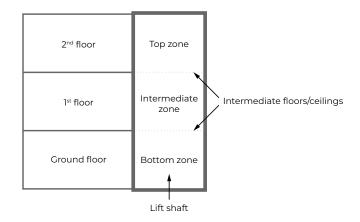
Section of a domestic lift shaft servicing 3 levels of a building
